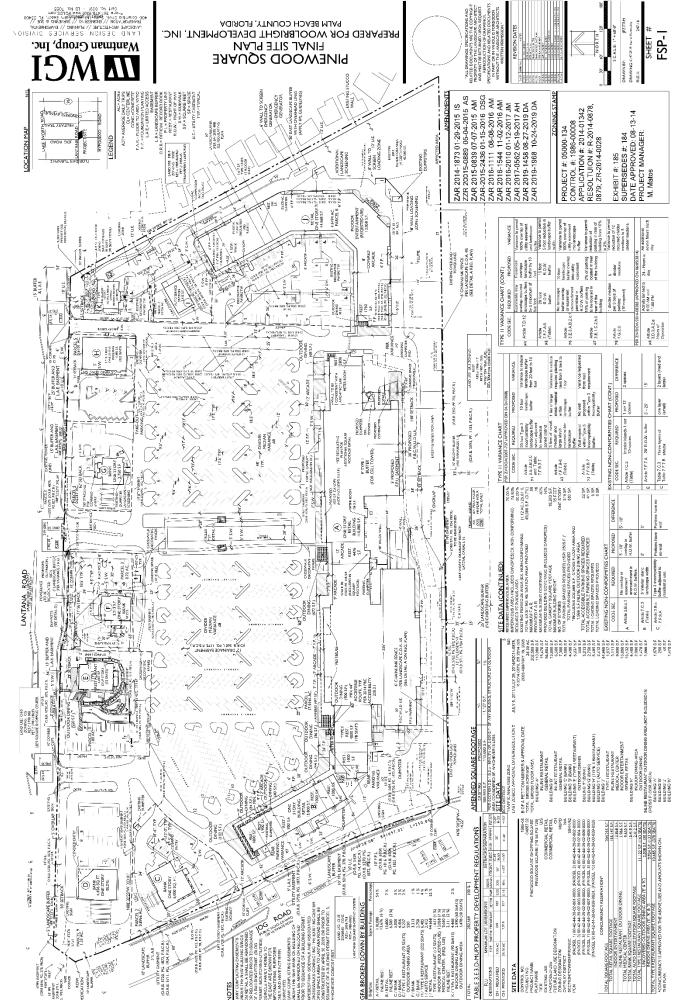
Approved Final Site Plan (FSP-1) dated August 13, 2014
